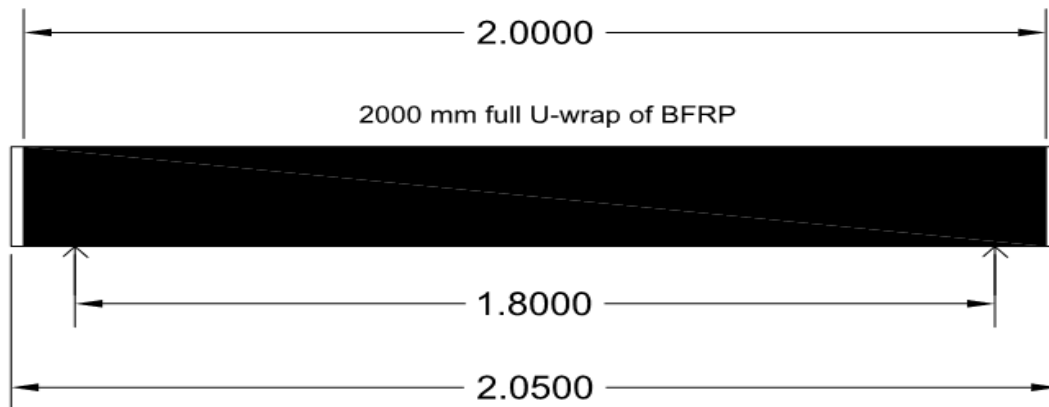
Details of Beam Strengthened with Arrangement-I
